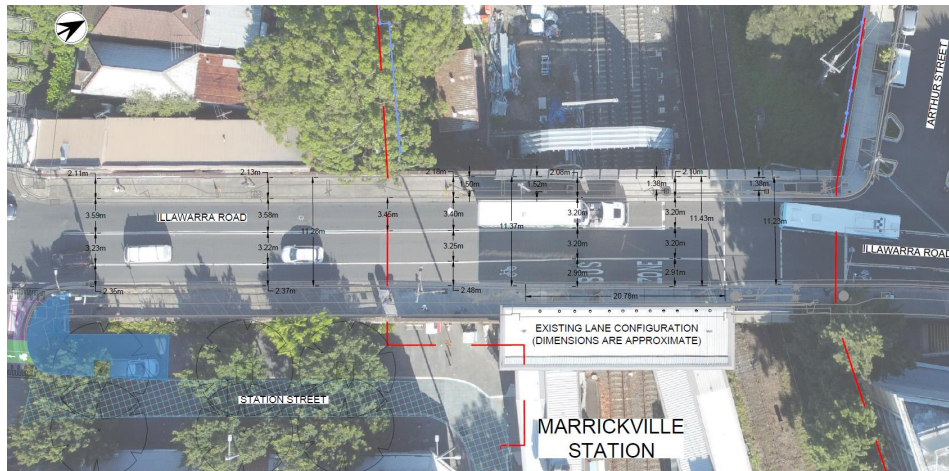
Plan of the existing lane configuration of Illawarra Road at Marrickville Station
